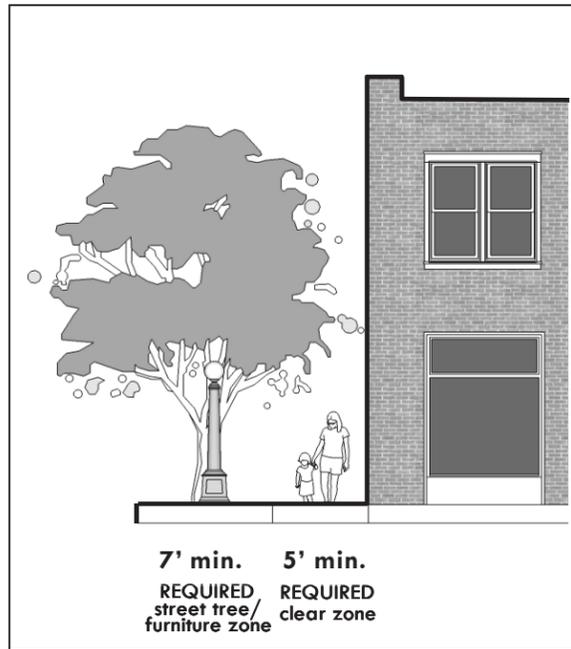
TOD Pedestrian Priority Street sidewalk width requirements.
